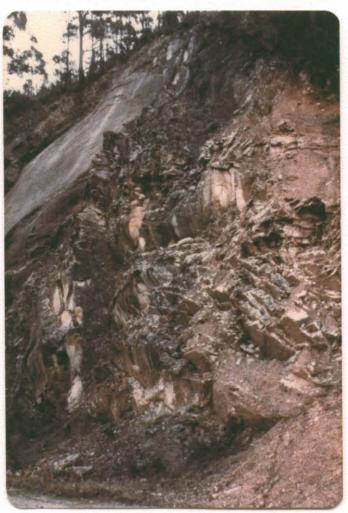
Bedding with a component of dip towards face resulting in a lower face slope angle, and instability leading to wedge and planar failures.
